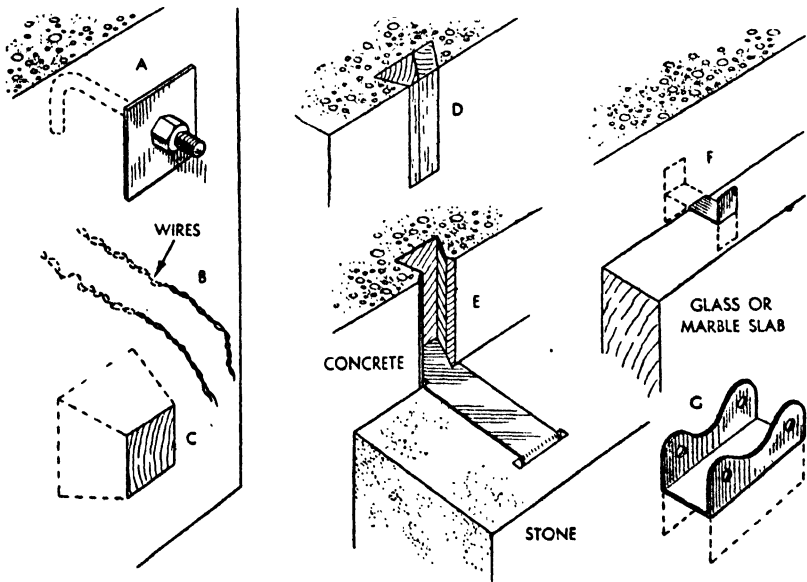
Methods of arranging fastenings to concrete. A. Bolt built in wall during casting; B. wires used to hold shuttering may be used as fixing agency; C. dovetailed wood block; D. dovetailed strips in chase; E. patent dovetailed slot and anchor for stone facing; F. bronze cramp for marble facing; G. clips for joists.
